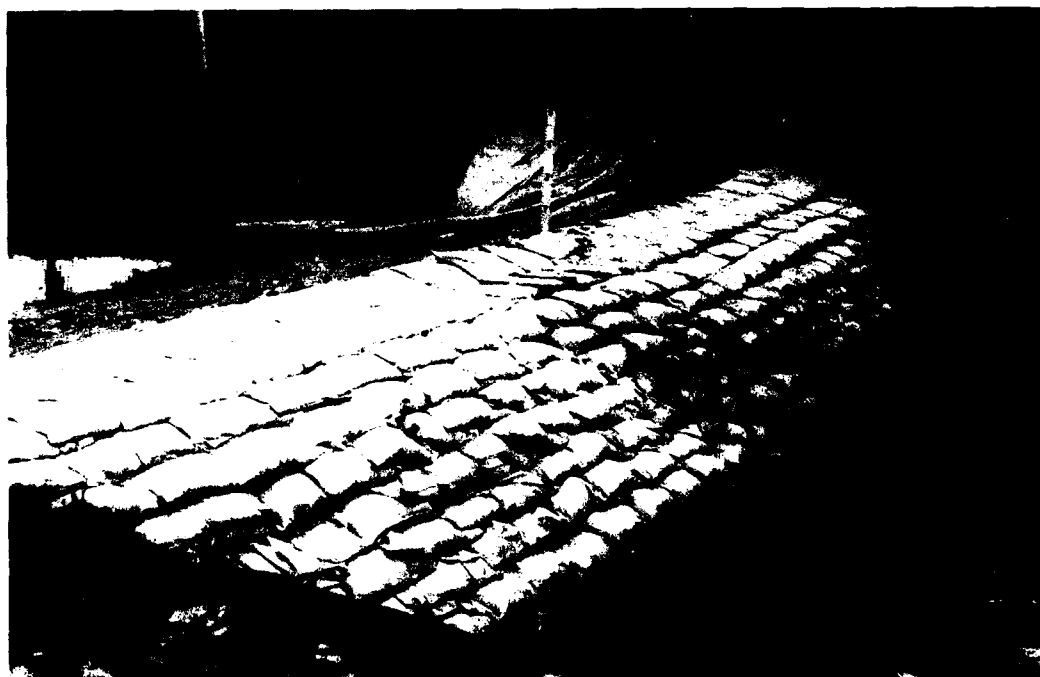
Landside view of Section 4-1 after 19 hr of wave attack
